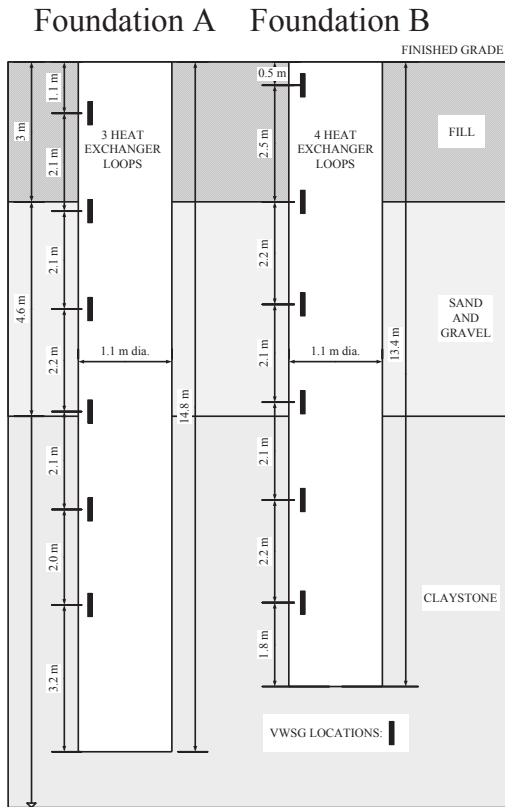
Soil stratigraphy and foundation instrumentation layout
